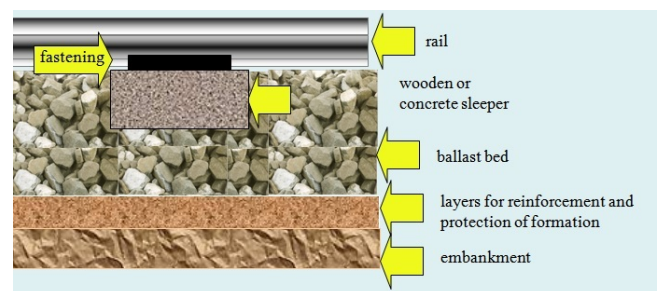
The elements of the track superstructure with ballast bed and substructure [6]
